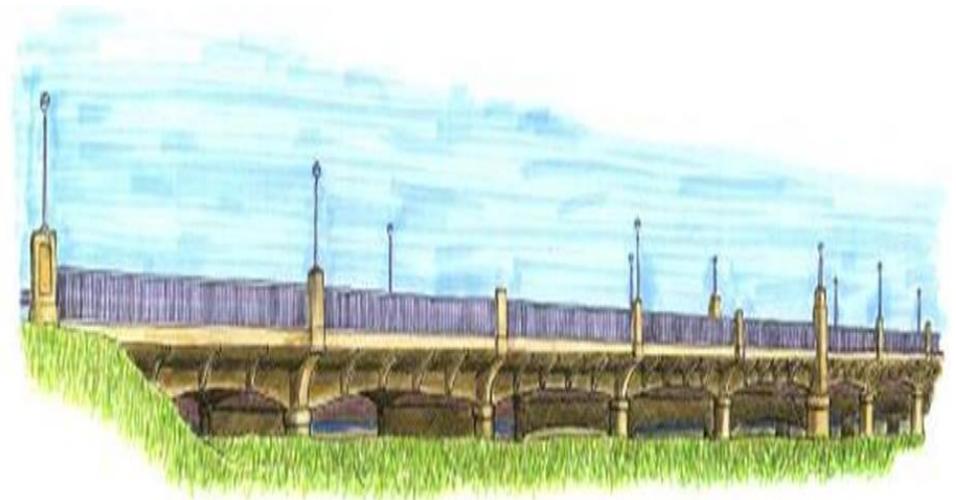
Artist's impression of the proposed piled viaduct replacement structure
